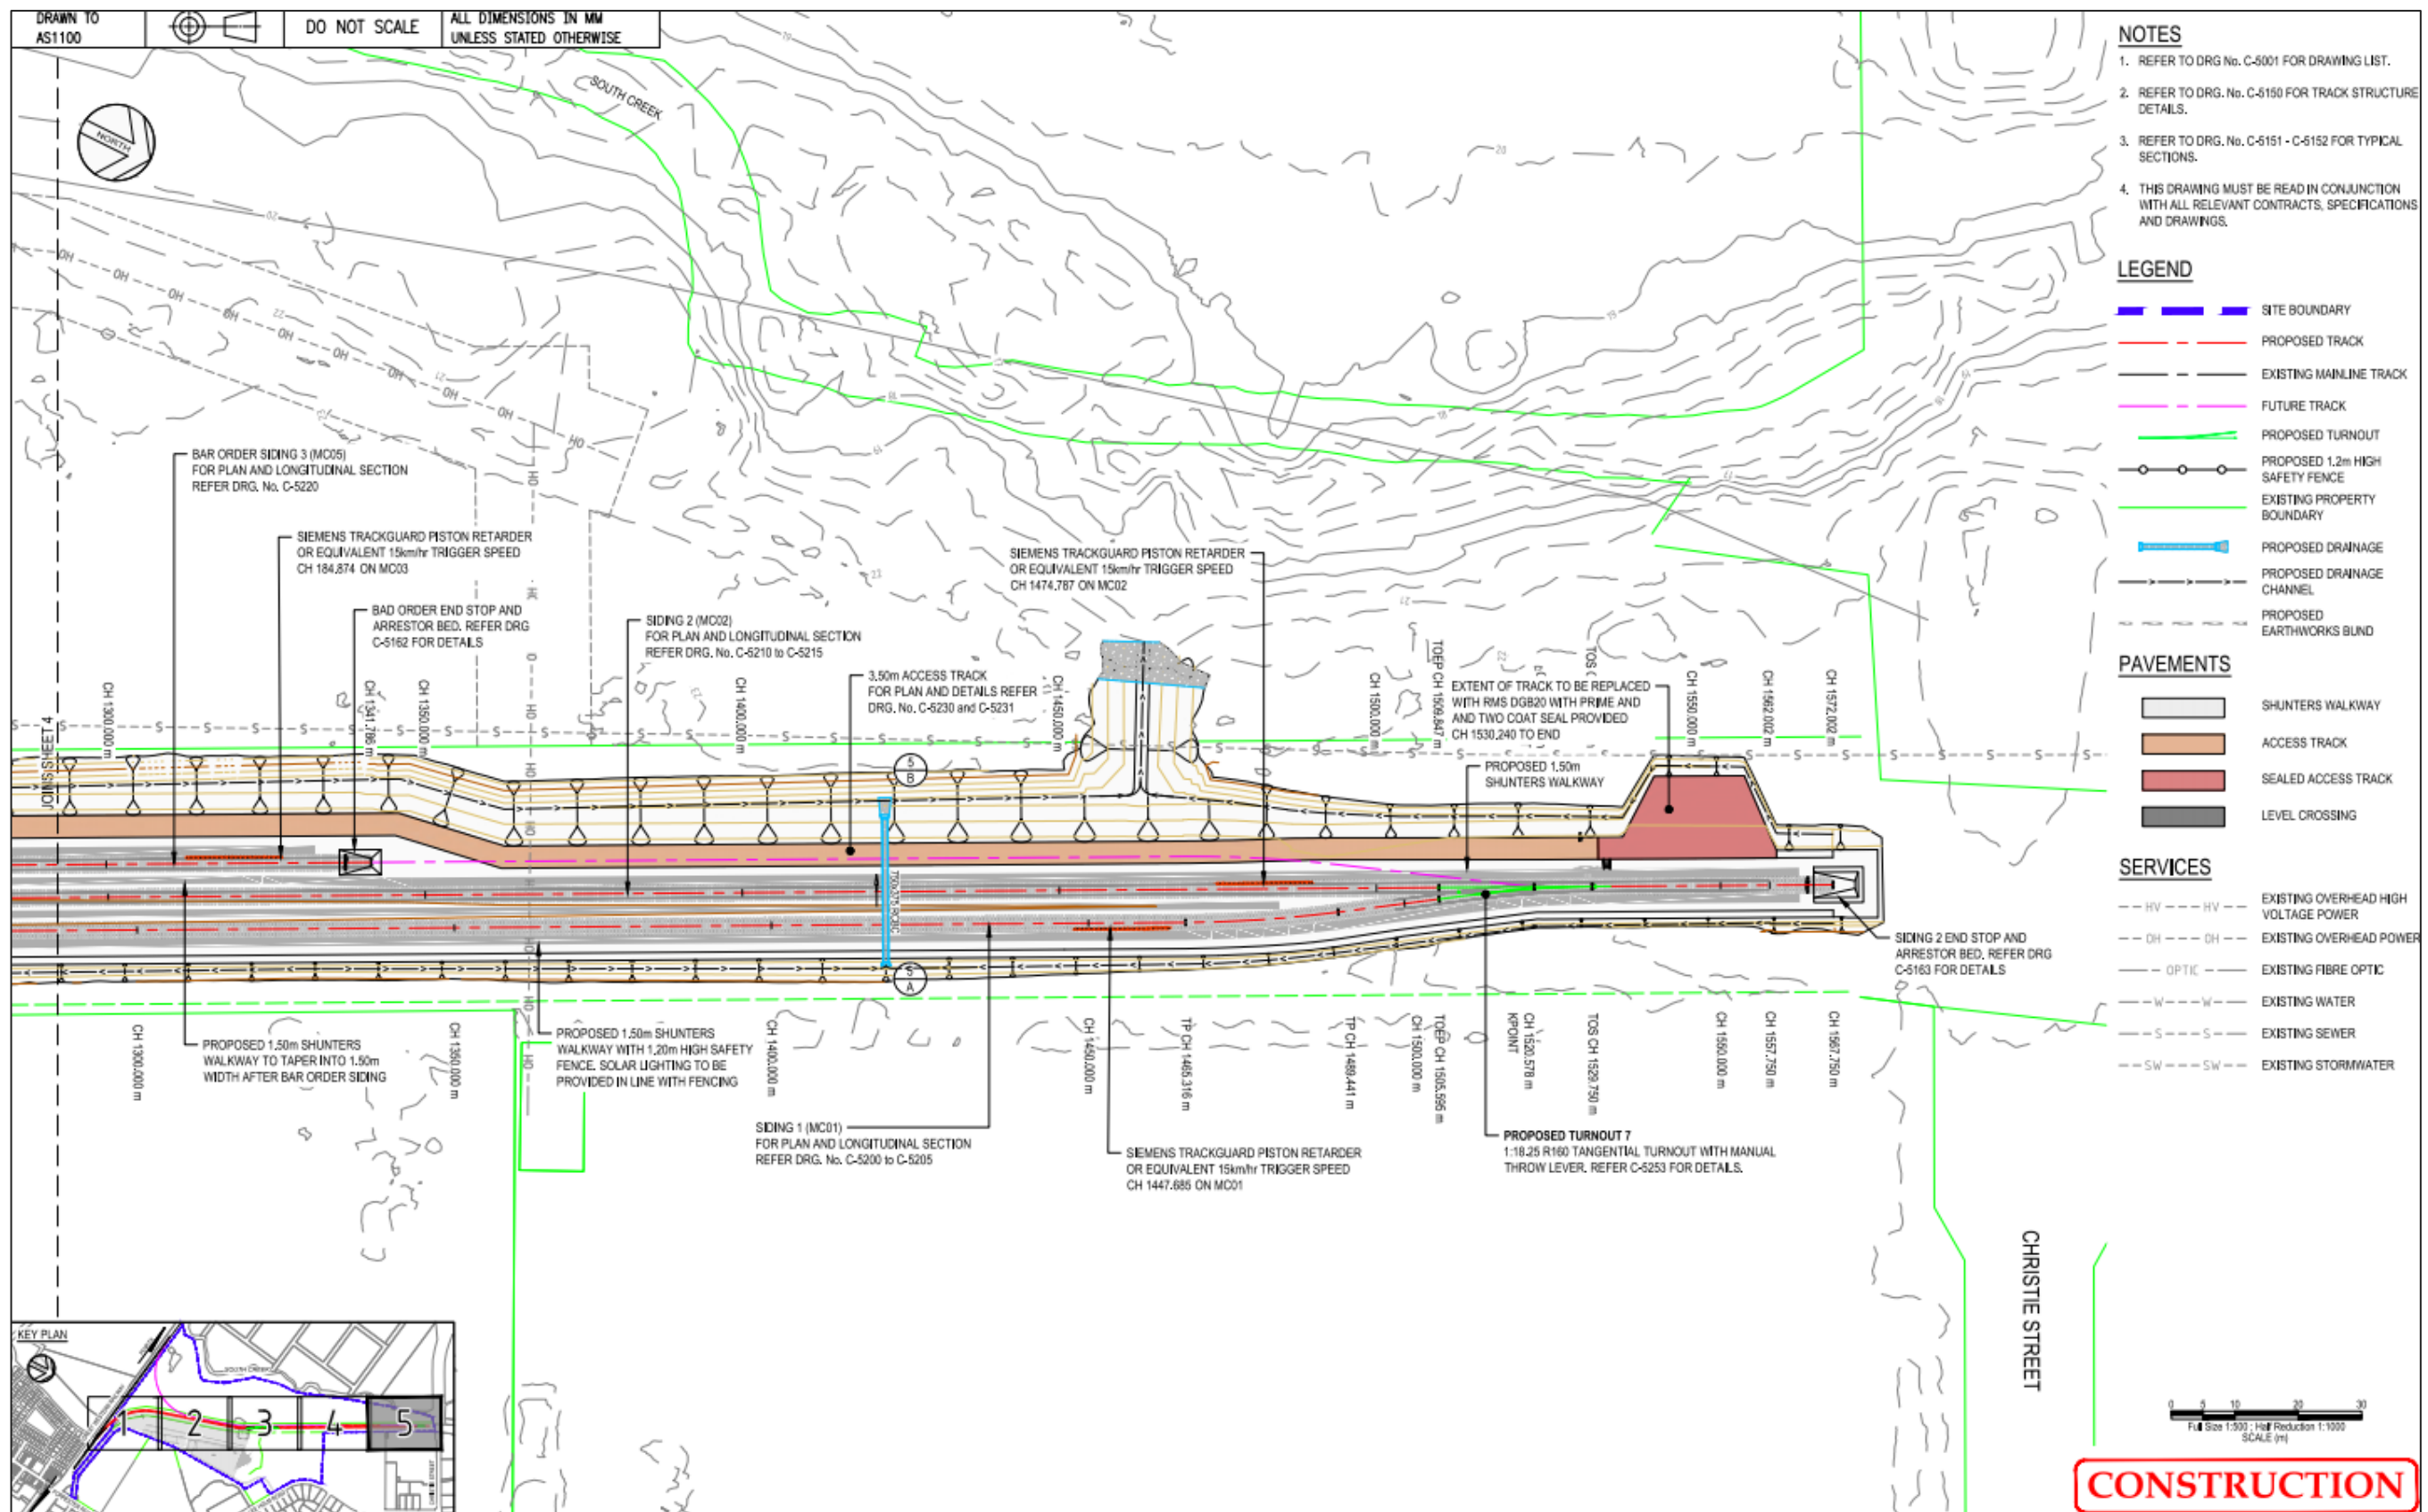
| Rail refurbishment works engineering drawings – Sheet 05 of 05 (Source: Applicant's Modification Report)
